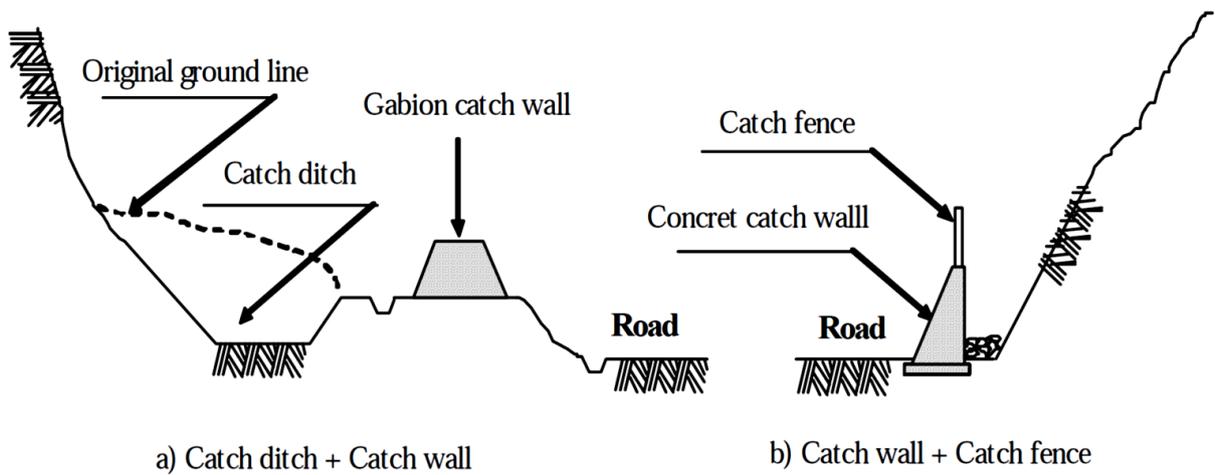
Typical construction schemes of rockfall protection systems (JICA, 2009)
